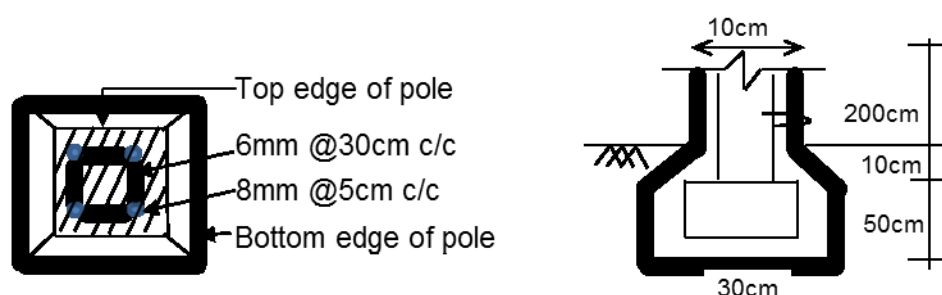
Typical reinforced concrete post & barbed wire arrangement
